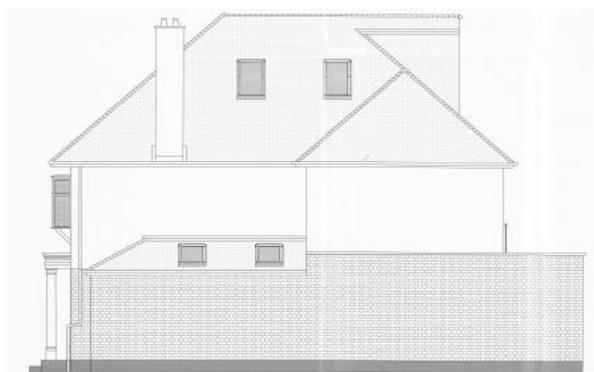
Refused 21/01466/FULL6 - Rear Elevation
